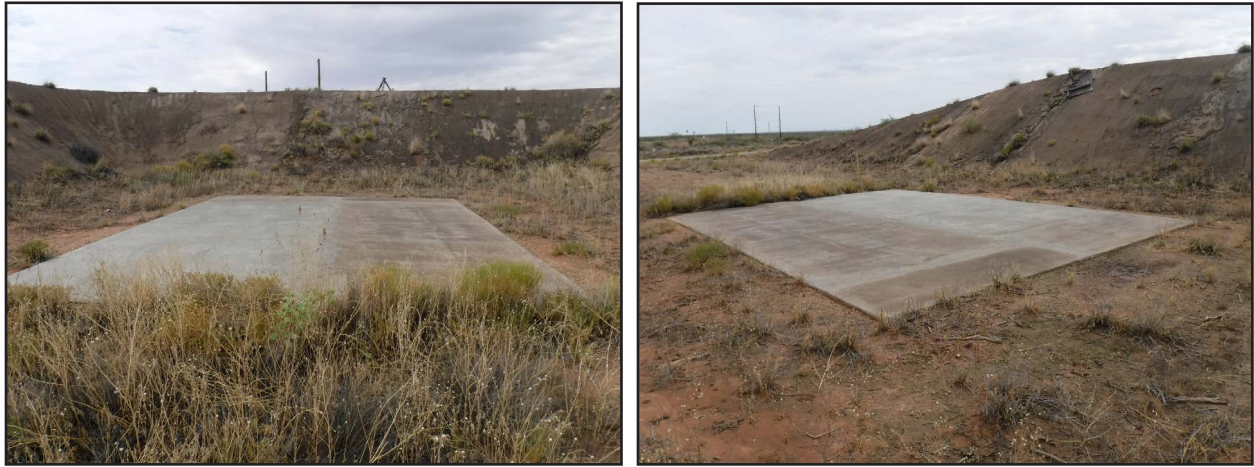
Patriot Pad and Revetment, concrete slab foundation, view to the north (*left*); view to the northeast (*right*).
